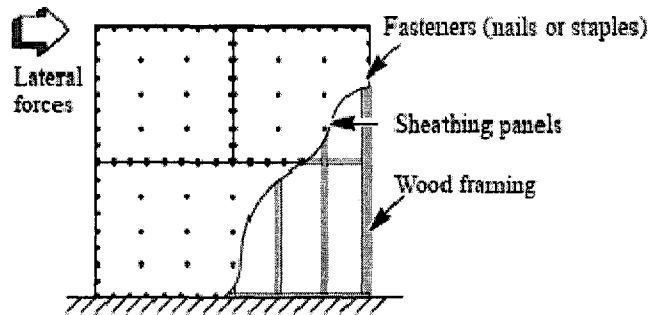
primary structural components of wood frame shear walls (Judd 2005)
